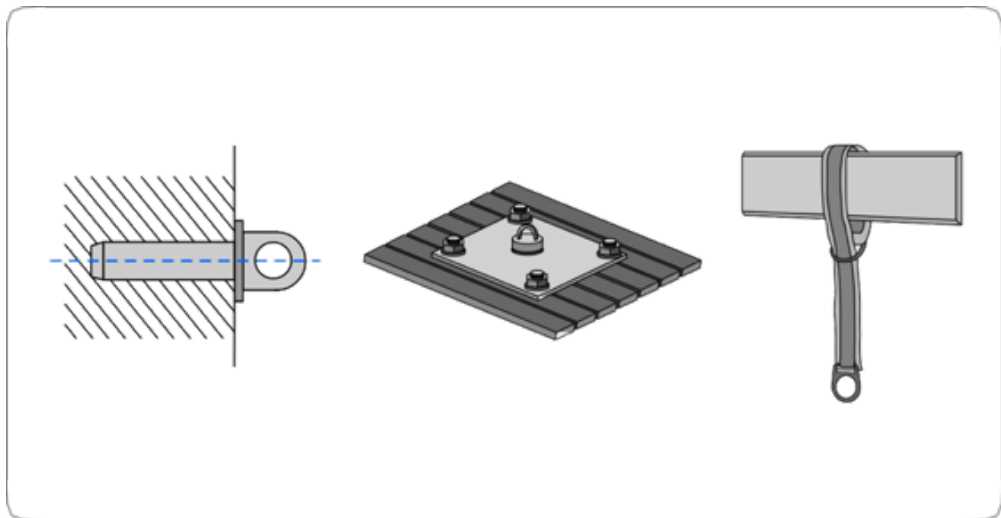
Examples of anchor devices — eyebolt (left), roof anchorage (centre) and anchor sling.
